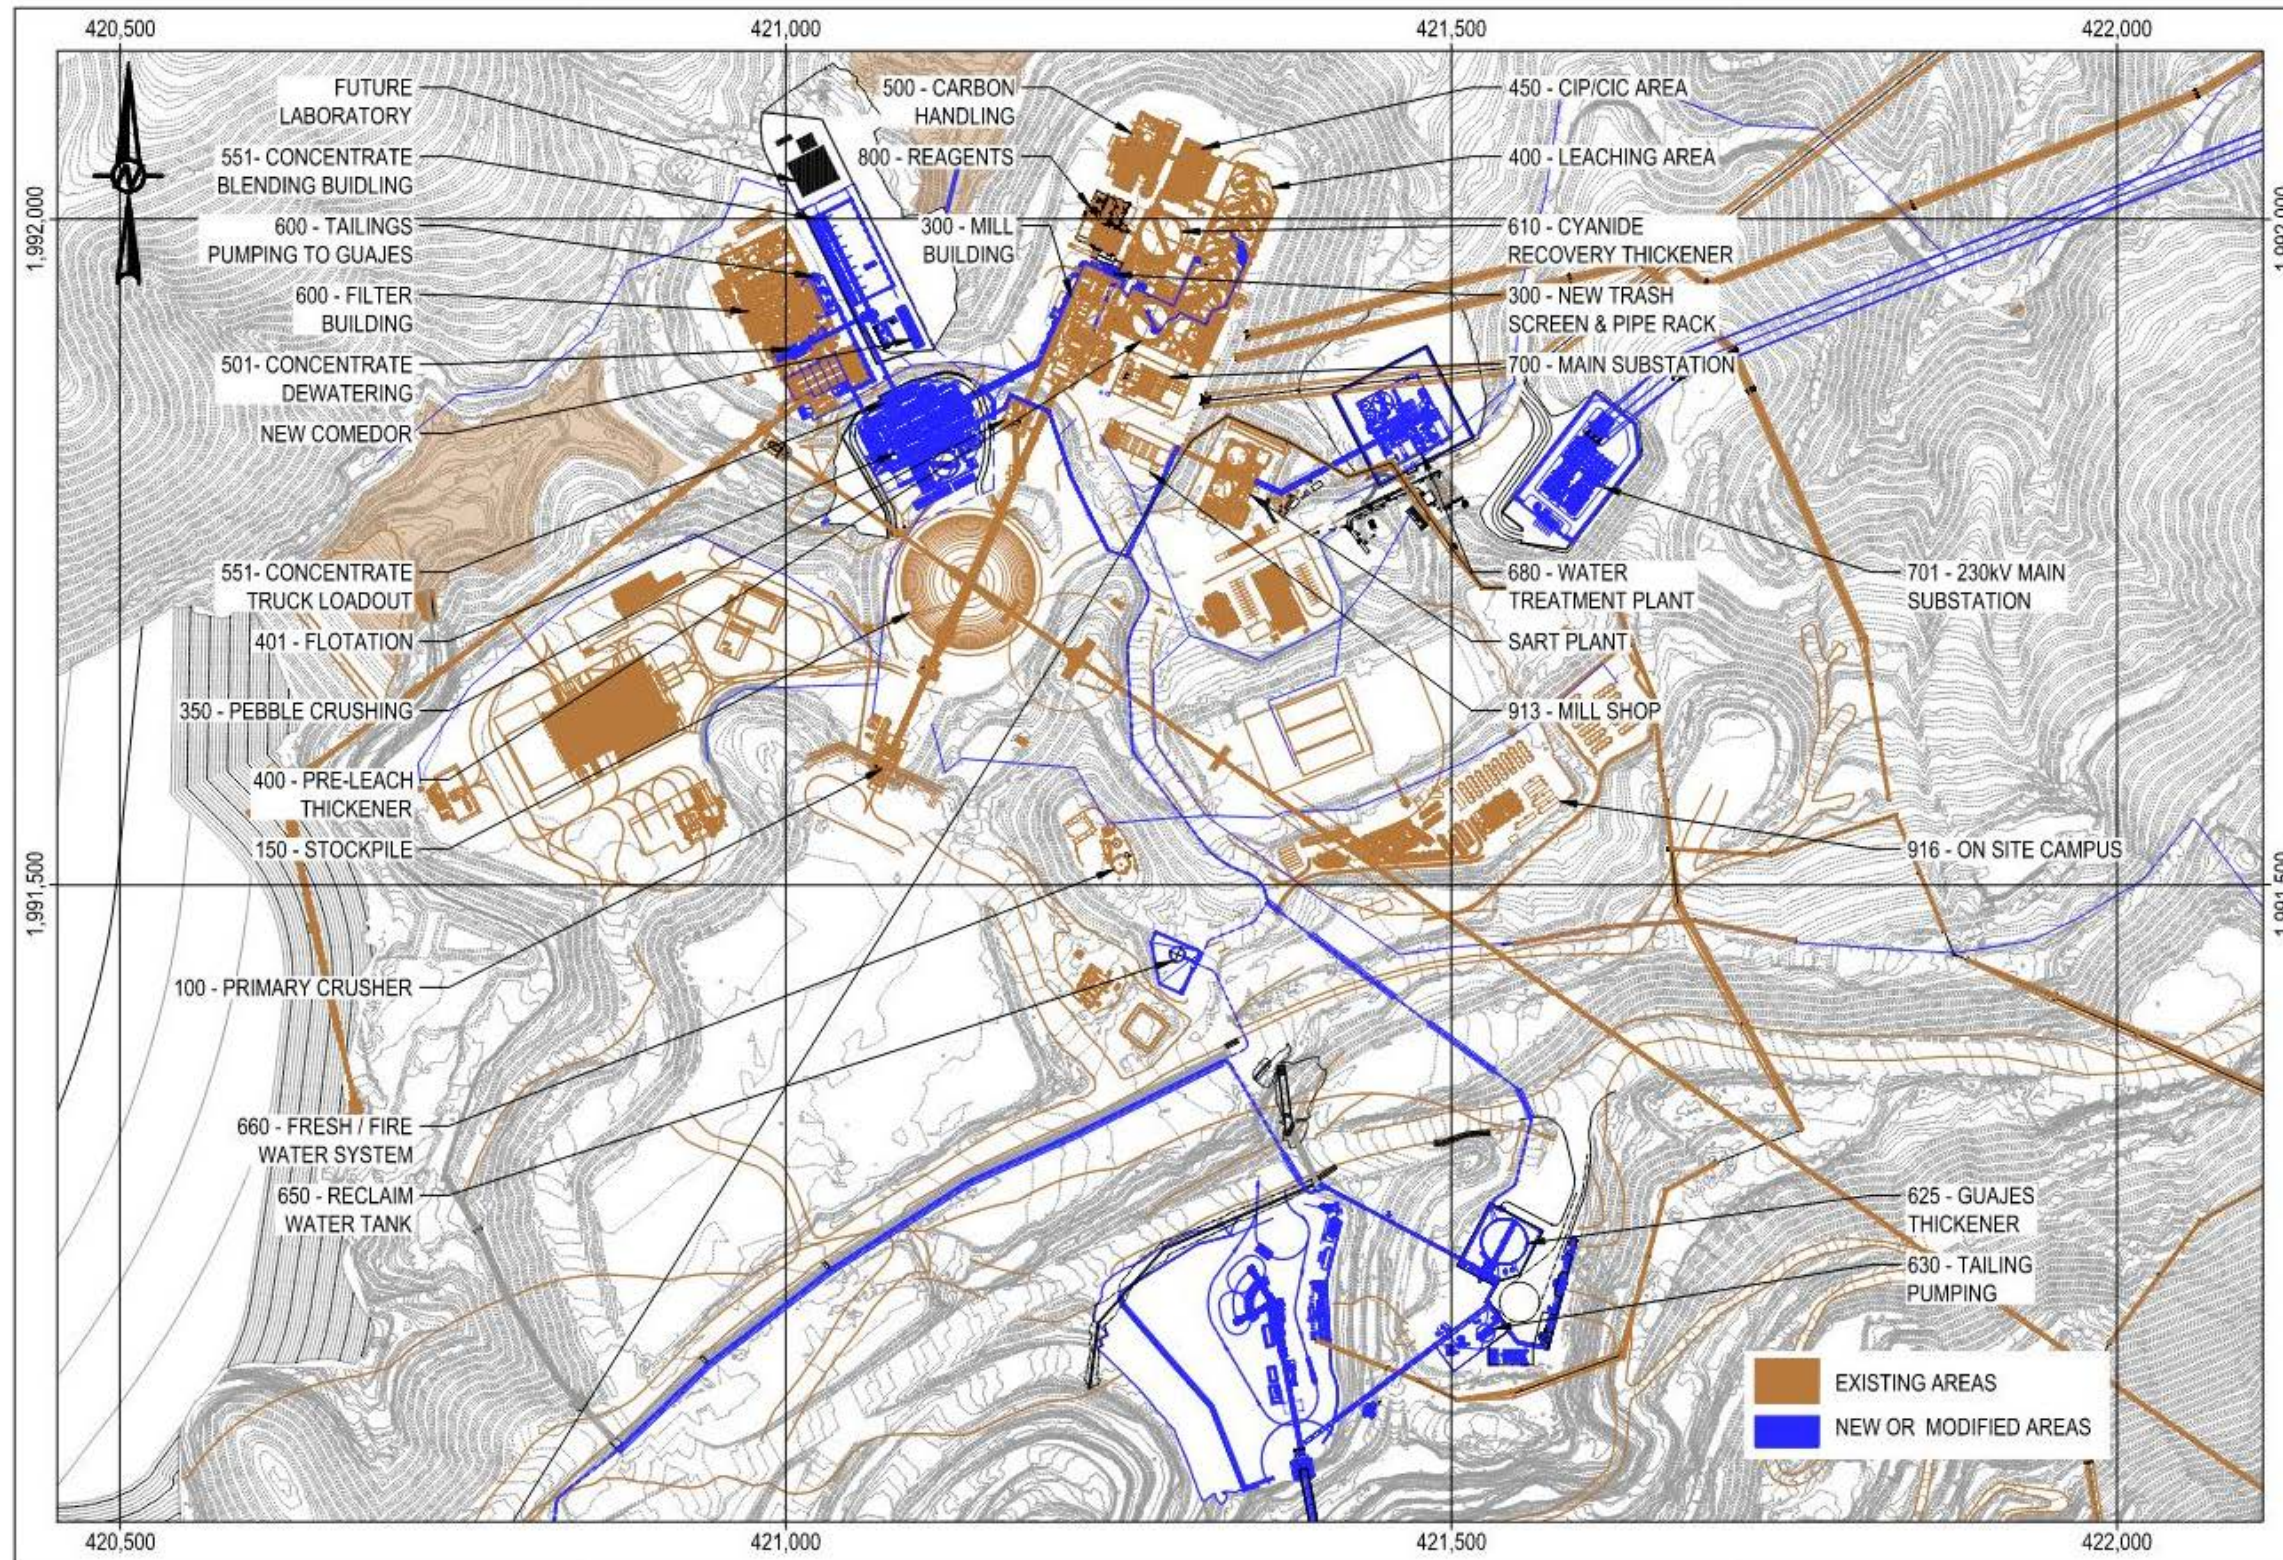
New Media Luna Process and Electrical Infrastructure to be Installed at the ELG Mine Complex
